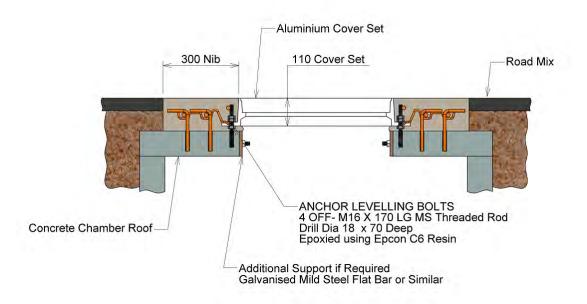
Retrofit Frame Installation on Concrete Roof Refer Fig 3 for Additional Details
